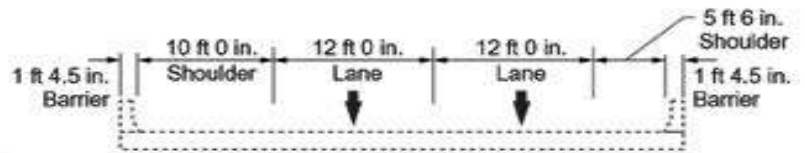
Lane dimensions of the existing bridge approach slab (looking east). (Note 1 ft. = 0.3m; 1 in. = 25 mm)
